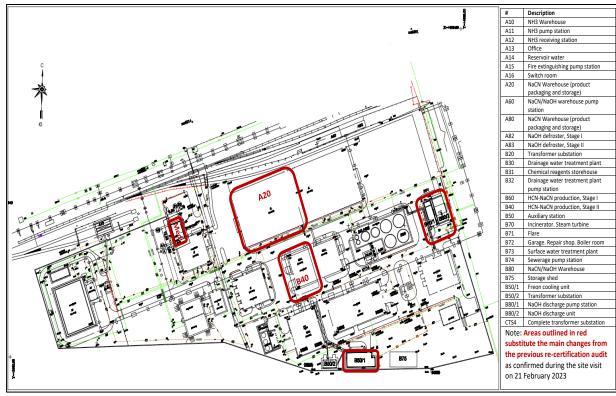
Korund Zyan Site Layout with Existing and Newly Commissioned Facilities
